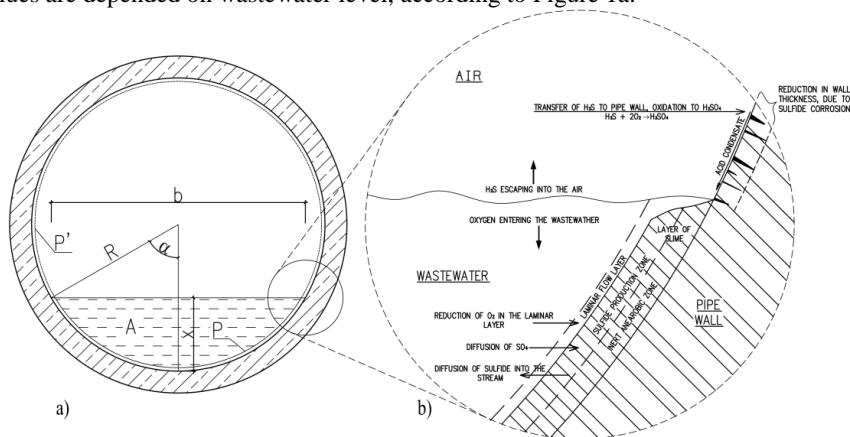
a) Geometrical dimensions in the pipe cross-section. b) Processes in the sulphate corrosion.
